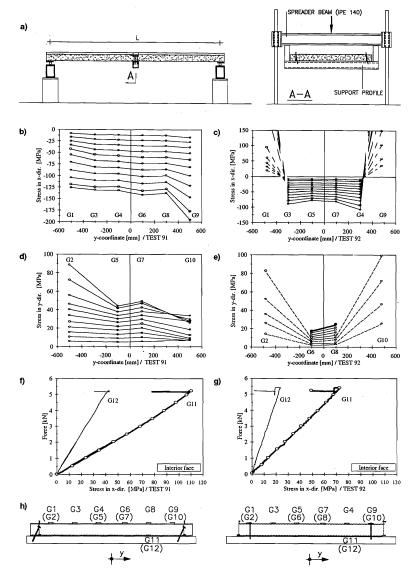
Experimental results based on measured strains in three-point bending tests with two fastening systems; special hidden fasteners (Test 91) and screw fasteners (Test 92). a) Test arrangements, bc) stresses of the compressed face in the longitudinal and de) in the transverse direction at the mid-span of the specimen, fg) longitudinal tensile stresses (G11) and transverse compressive stresses (G12) in the lower face and h) cross-sections of the specimens and locations of the strain gauges. Markers on the curves in f) and g) show the load levels, on which the stress distributions are presented in figures b)-e).
